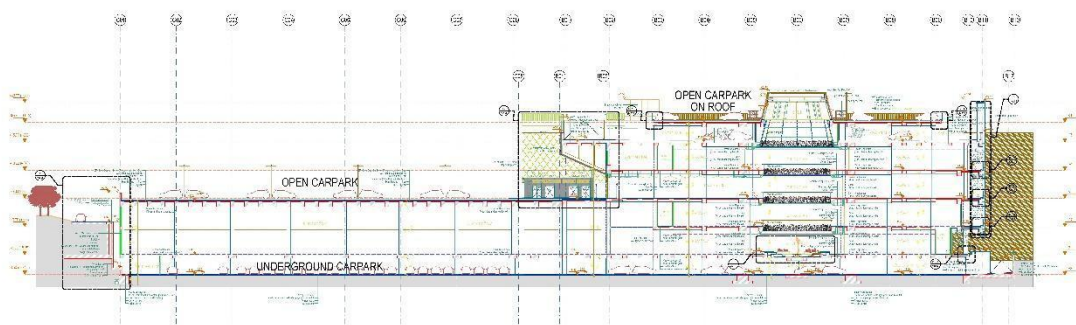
Longitudinal Section of Primemall Gaziantep.
